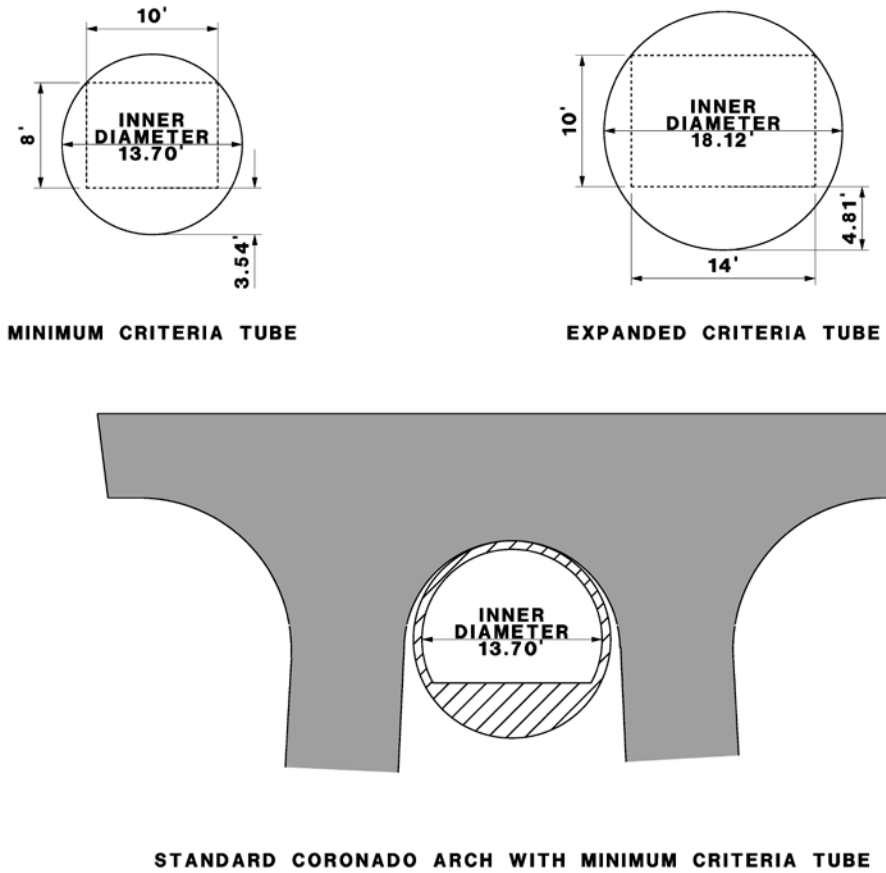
Bicycle/Pedestrian Facility Standard Cross Sections for a Tube Concept
